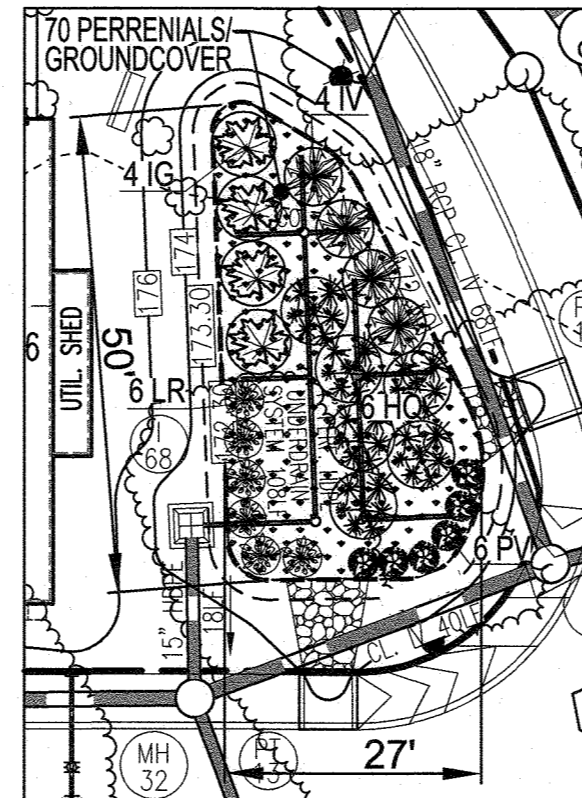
DETAILED BIO AND PLANTING PLAN (SWM #21)
